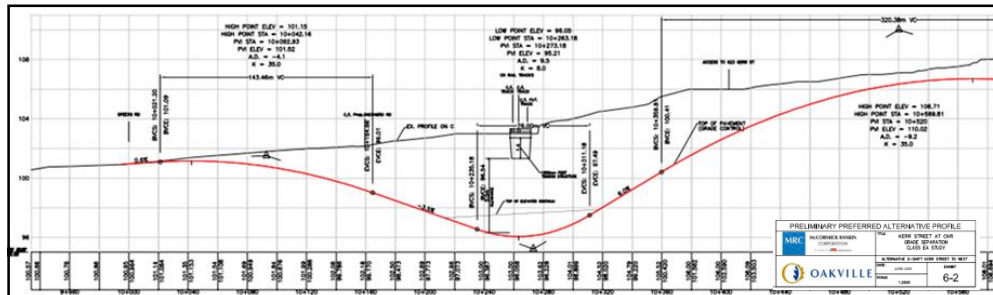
Section Illustrating Changes to Grade along Kerr Street
